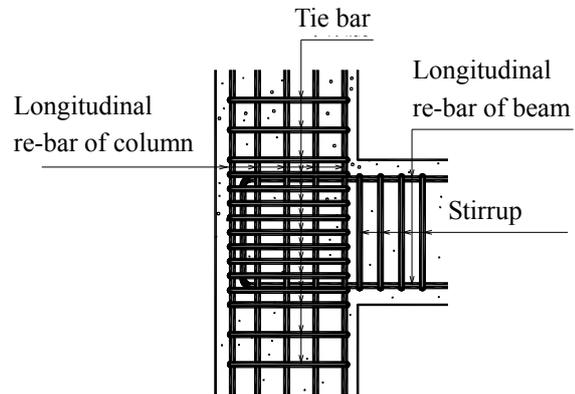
Example of anchorage of longitudinal re-bars in underground beam<sup>1)</sup>
